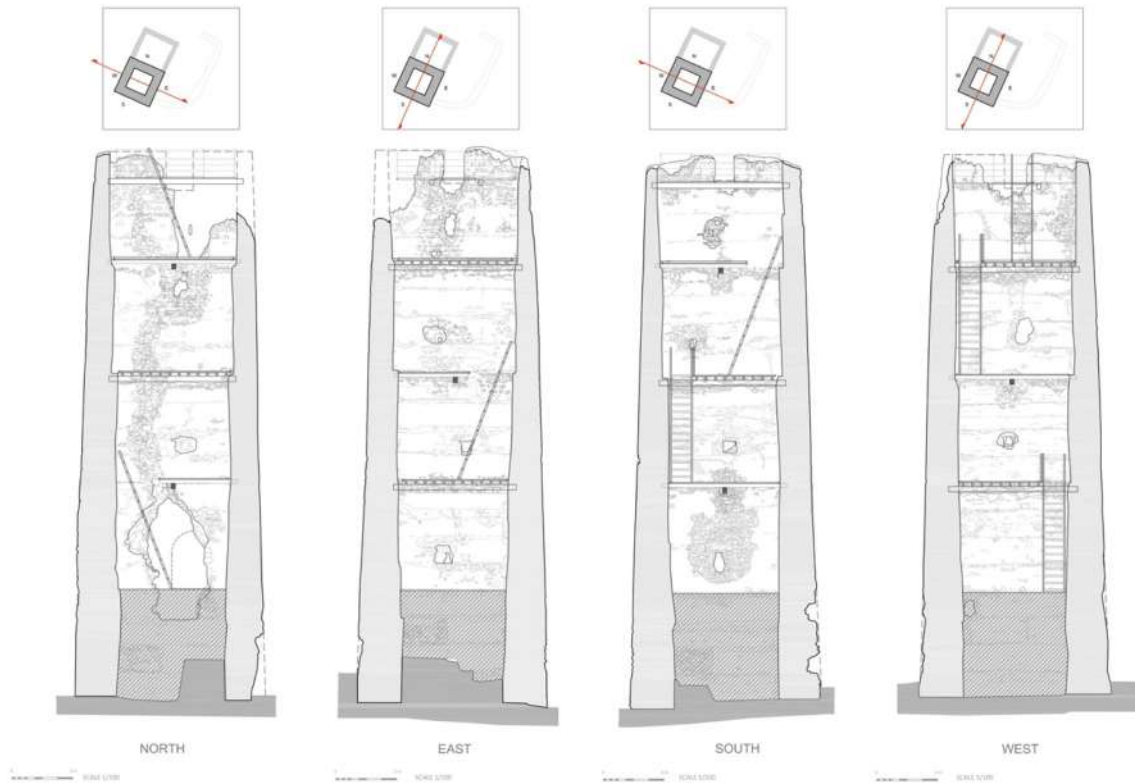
Project for new floors, ceilings and stairs (C. Mileto and F. Vegas).
